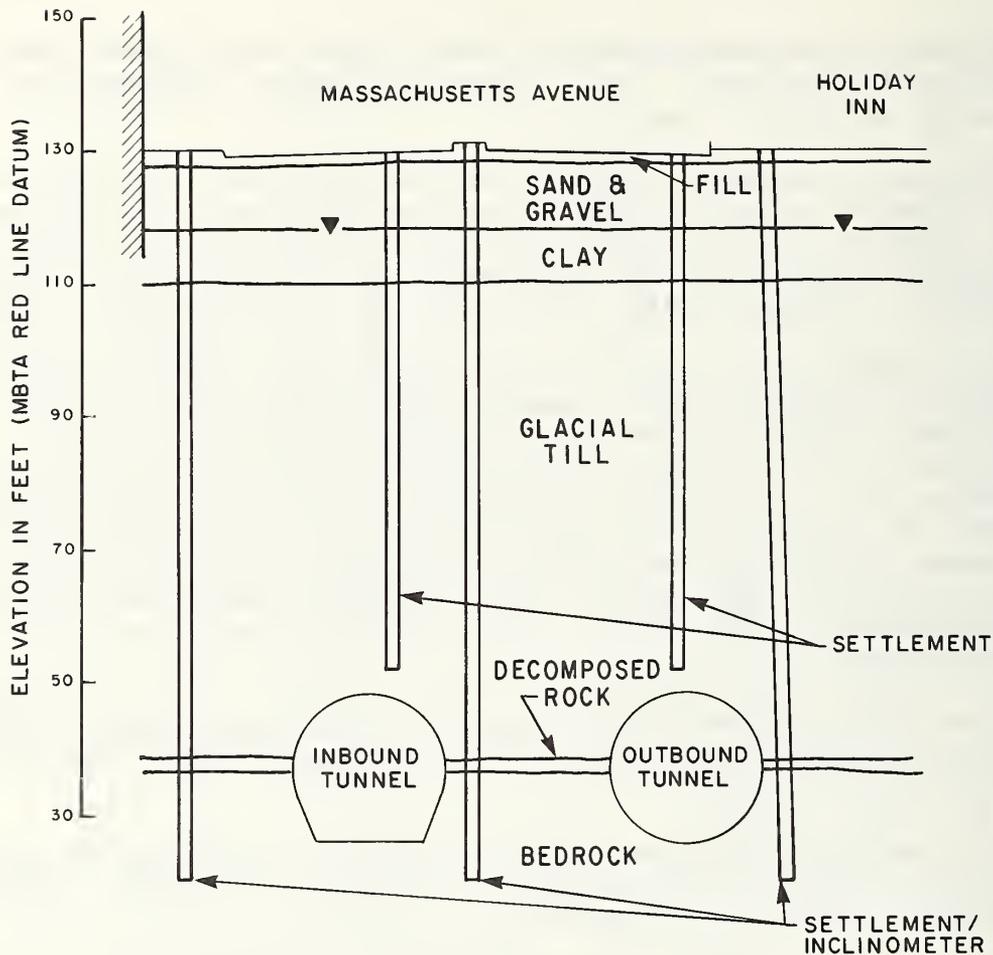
TYPICAL HIGH-INTENSITY INSTRUMENTATION SECTION
